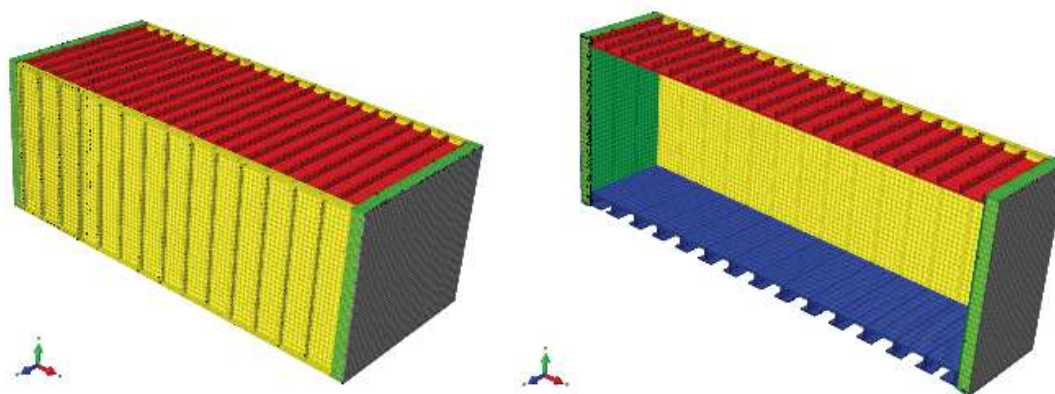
Single TVE (left) and a cross-section of the TVE (right). The floor is shown in blue, the ceiling in red, the apartment separating walls shown in yellow and the façade walls in green. Weather boards on the outside of the facade vertically embracing TVEs when stacked are shown in grey.
